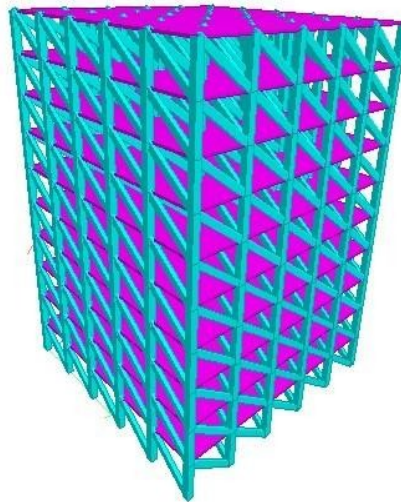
Isometric view of flat slab building having 100% infillwall
